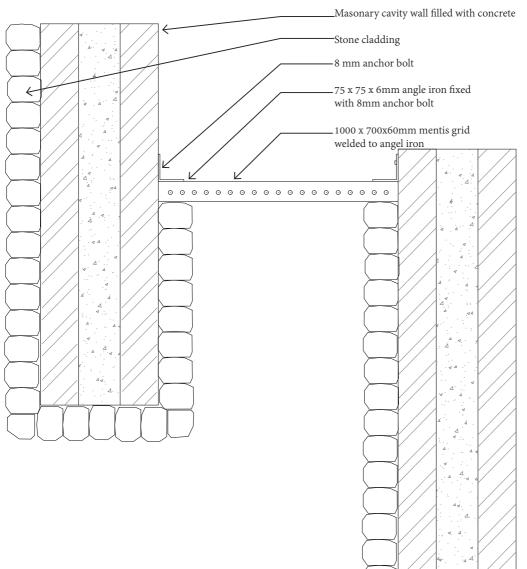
Detail AA1:plan detail of mentis grid fixing not to scale
